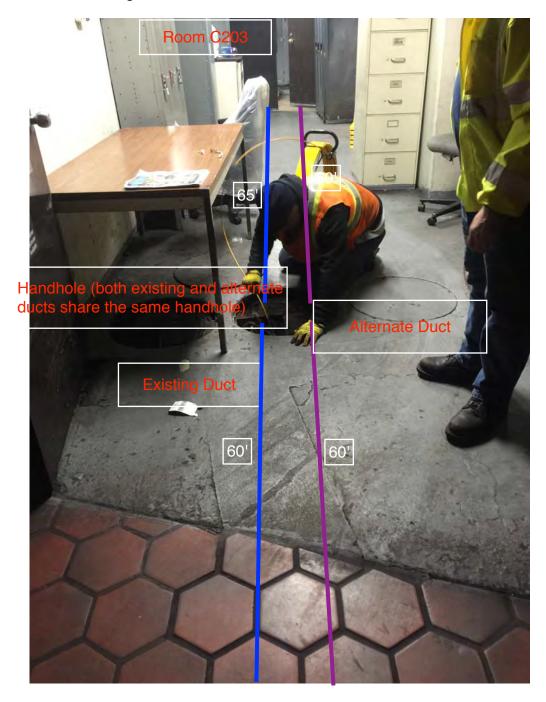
Existing and alternate duct runs, and proposed overhead conduit from Abandoned Communication Panel to AFC Panel (Room C203)
